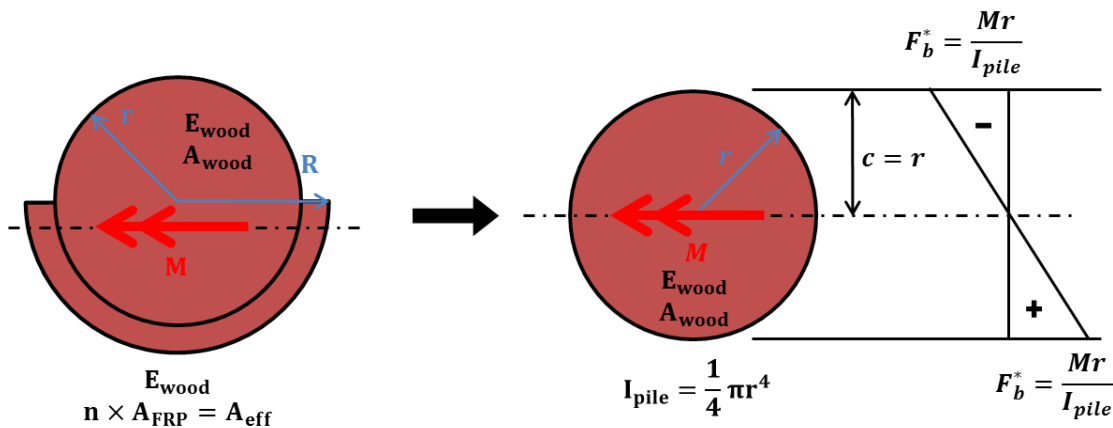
Elastic design approach for abutment pile FRP retrofit design
